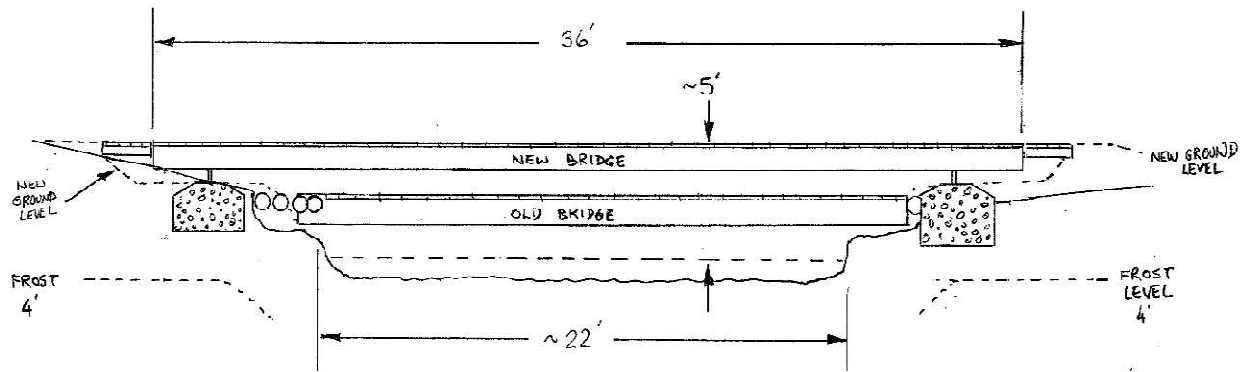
M1 location: existing bridge and replacement (looking downstream)
